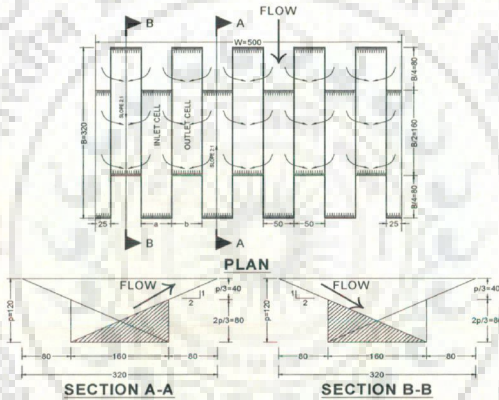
Plan and section of model  $P_2M_1$  (both sides ramping), (dimensions in mm)
